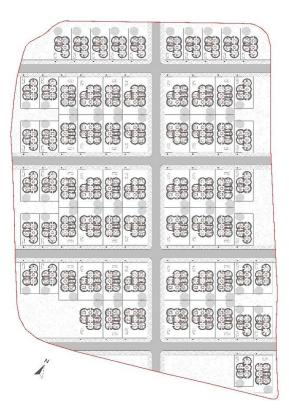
Prototype 1 (left) and Prototype 2 (right) house units placed on site
